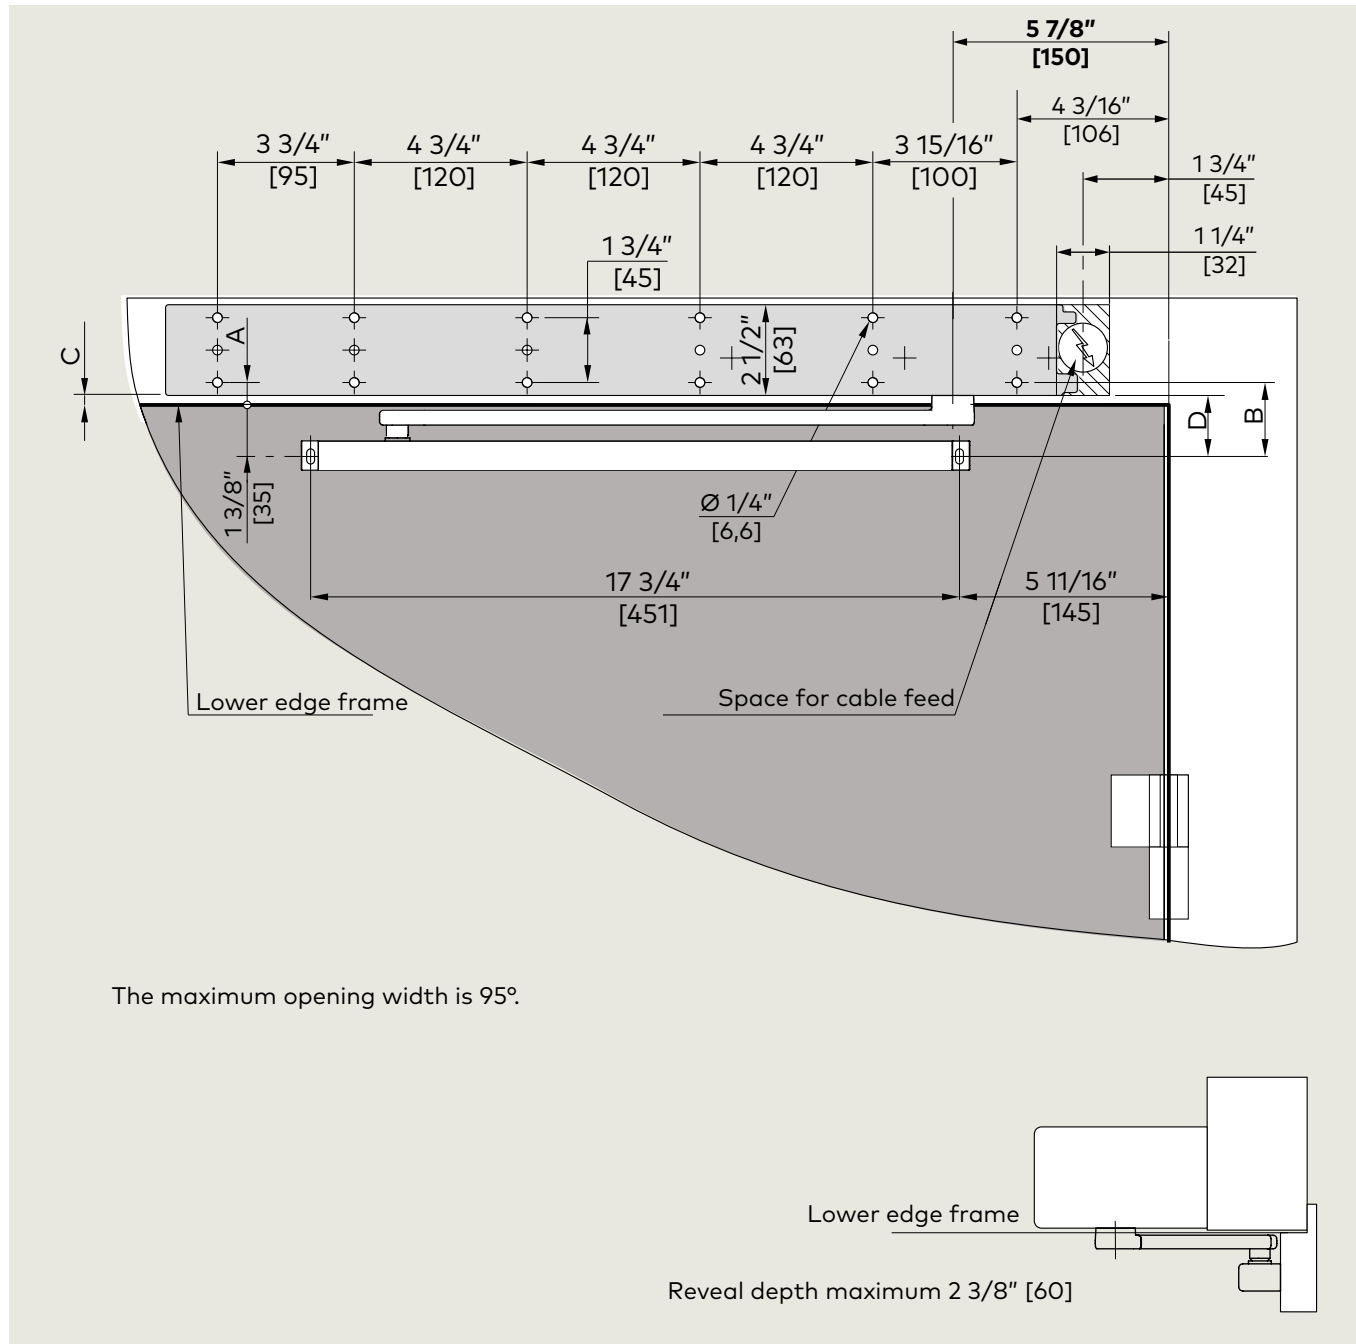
Assembly on hinge side, pull version with slide channel CPD and long pivot pin
